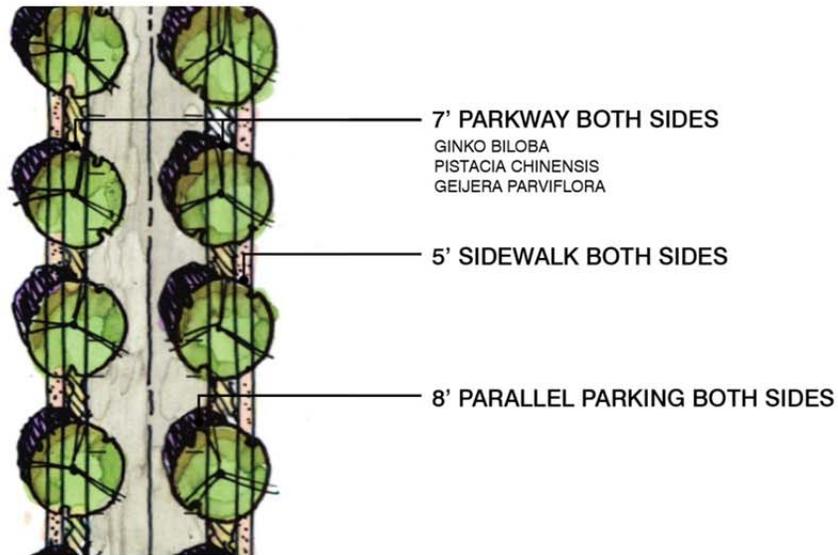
H. Street Sections: Celeste Road / Old Warren Road North of
